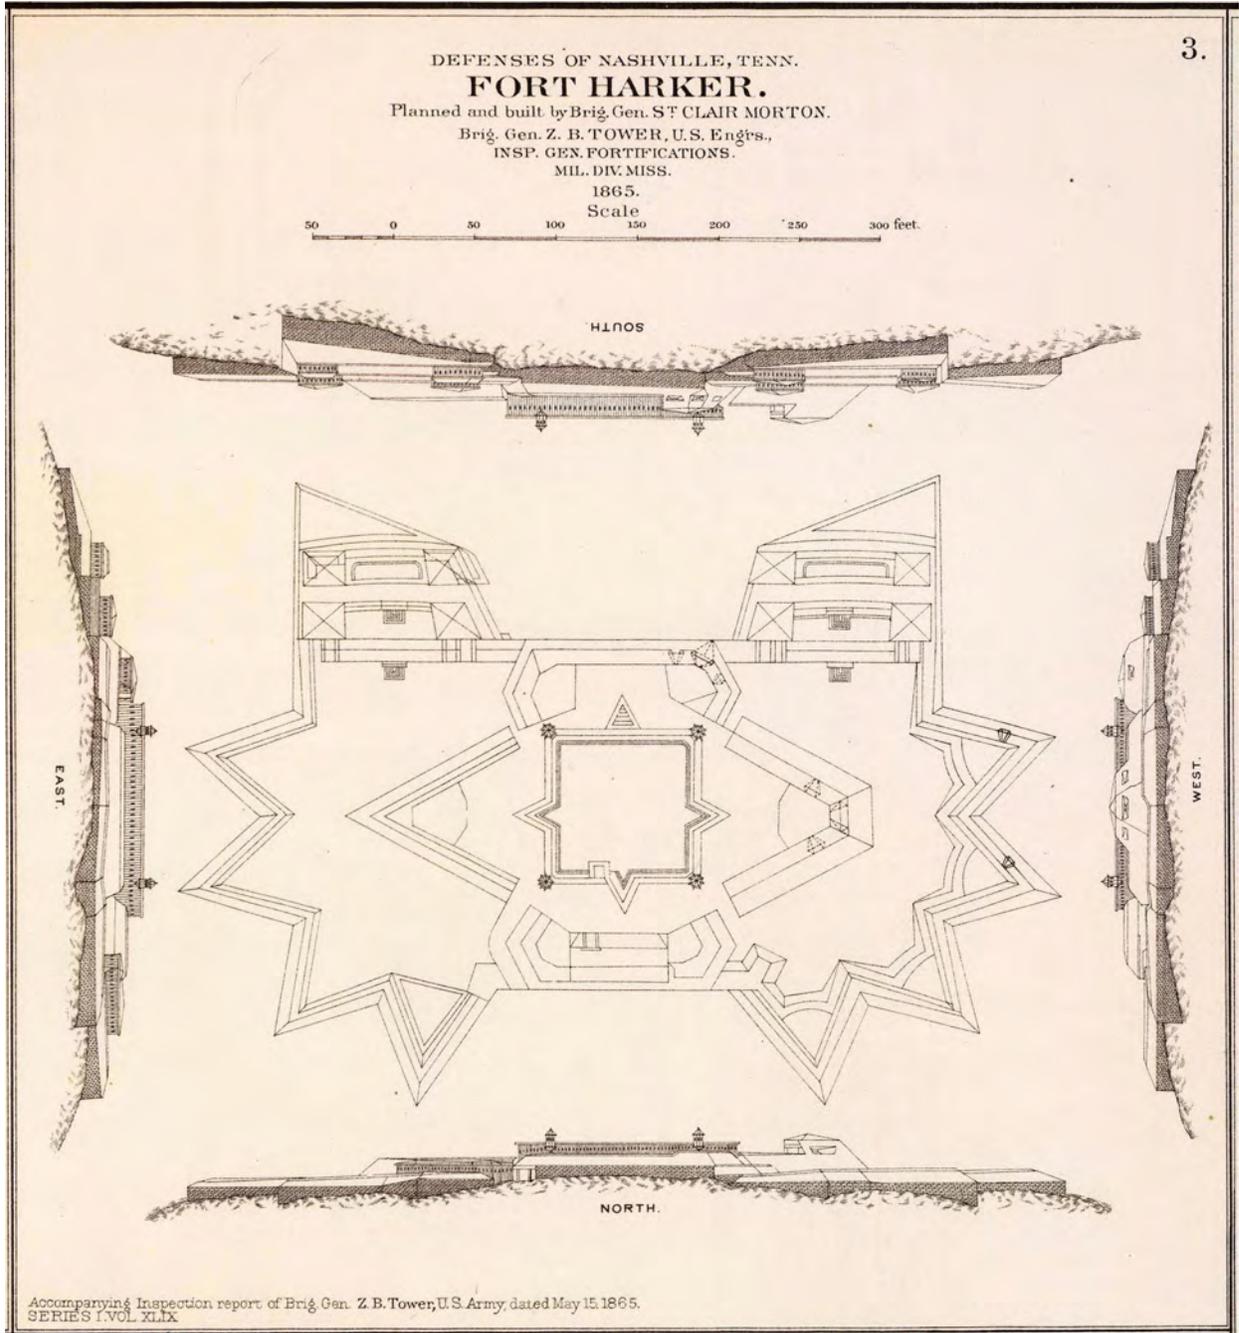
U.S. War Department plan and elevation drawings of Fort Negley (later briefly called Fort Harker).
